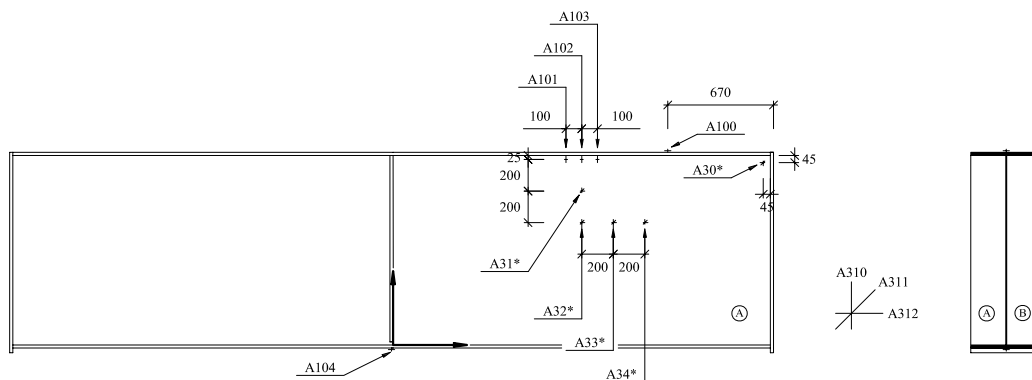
Basic layout of strain gauges (SP 1200), dimensions in [mm]
